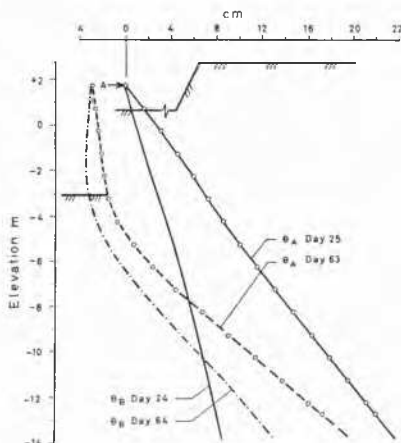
Initial inclination of the two measurement piles and their position after excavating to elevation — 3.0.
